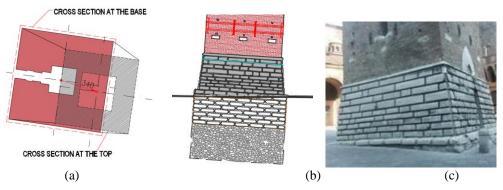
a) Tower cross section at two different heights (b) Foundation (c) External selenitic stones
